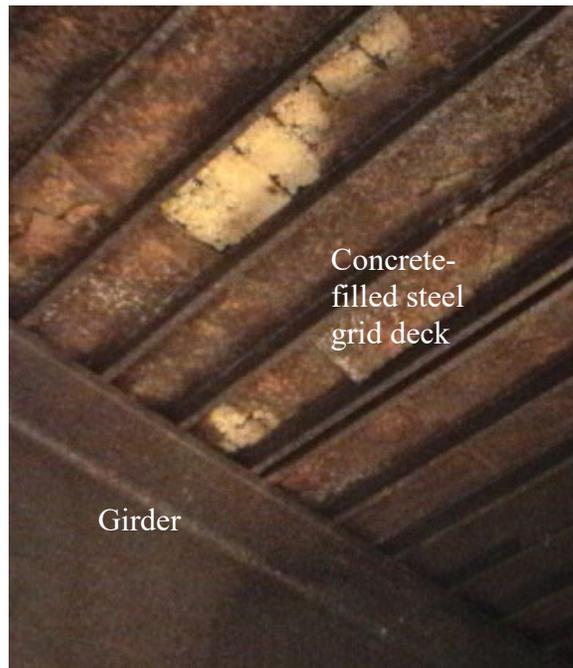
Concrete filled steel grid deck, without overfill, viewed from bottom, shows that bottom plate of deck has broken loose from water infiltrating between steel grid and concrete fill.
